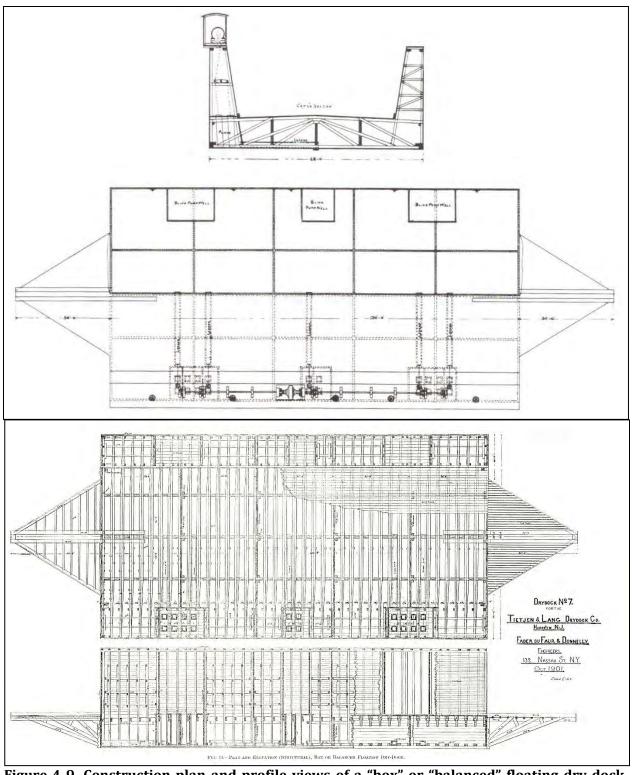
Construction plan and profile views of a "box" or "balanced" floating dry dock, similar to the Providence Dry Dock and Marine Railway Company's floating dry dock (source: Donnelly 1906).
